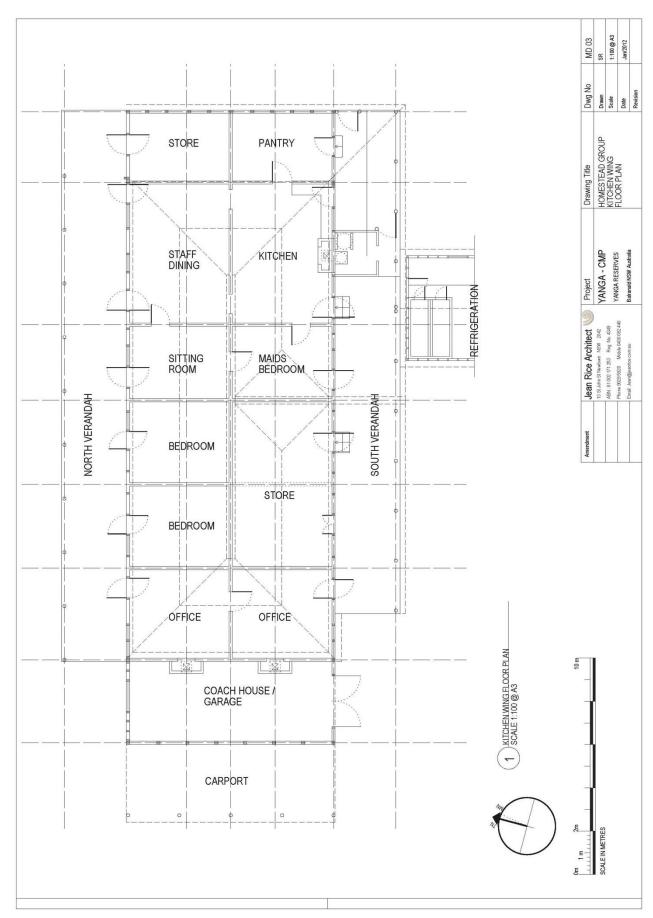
Homestead Group Kitchen Wing floor plan. Jean Rice Architect, site assessment 2009.
